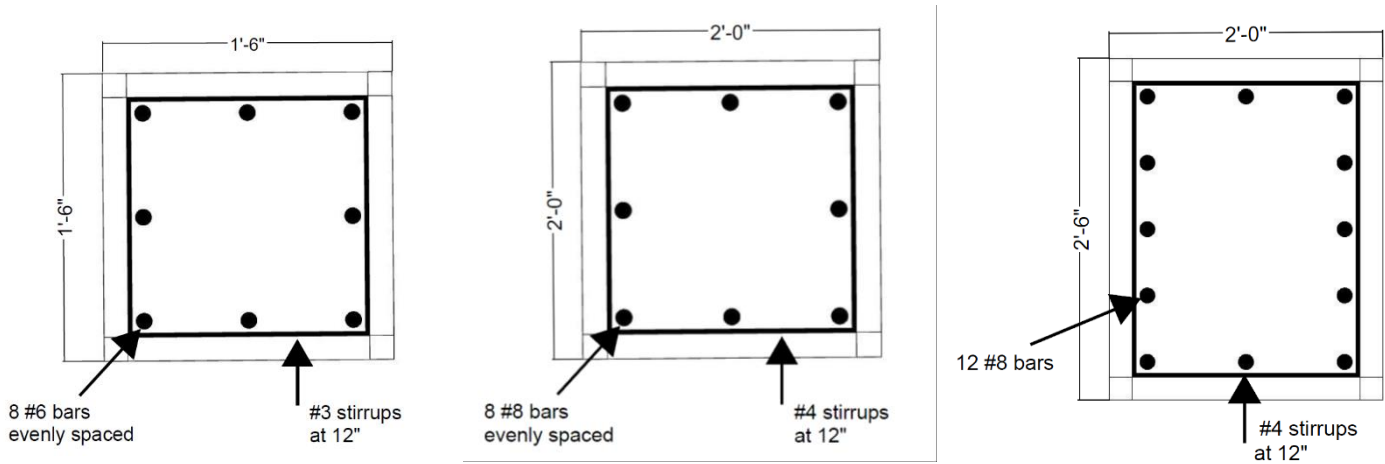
Details of the three columns designed. 18x18, 24x24 and 24x30.
